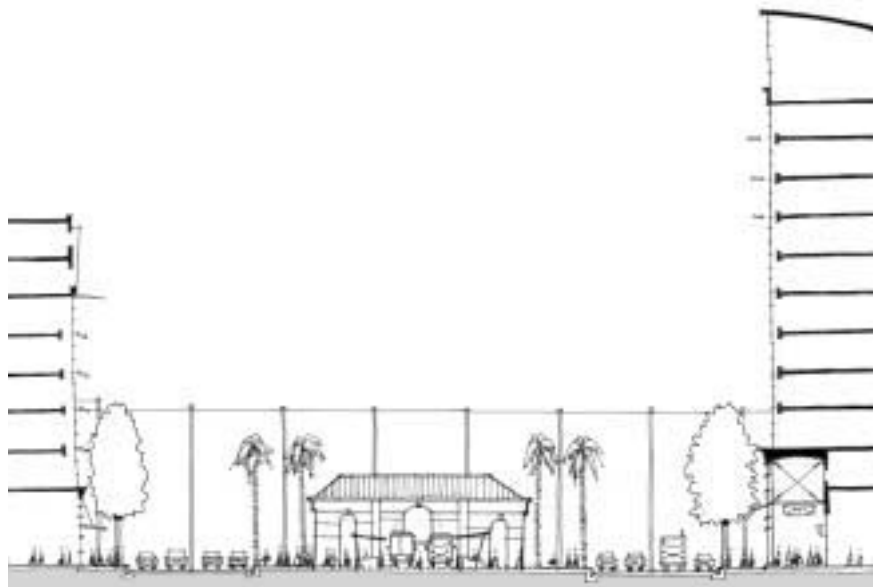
Section: 220' Right of Way. Expanded green, 2 travel lanes, 1 or 2 parking lanes each way
